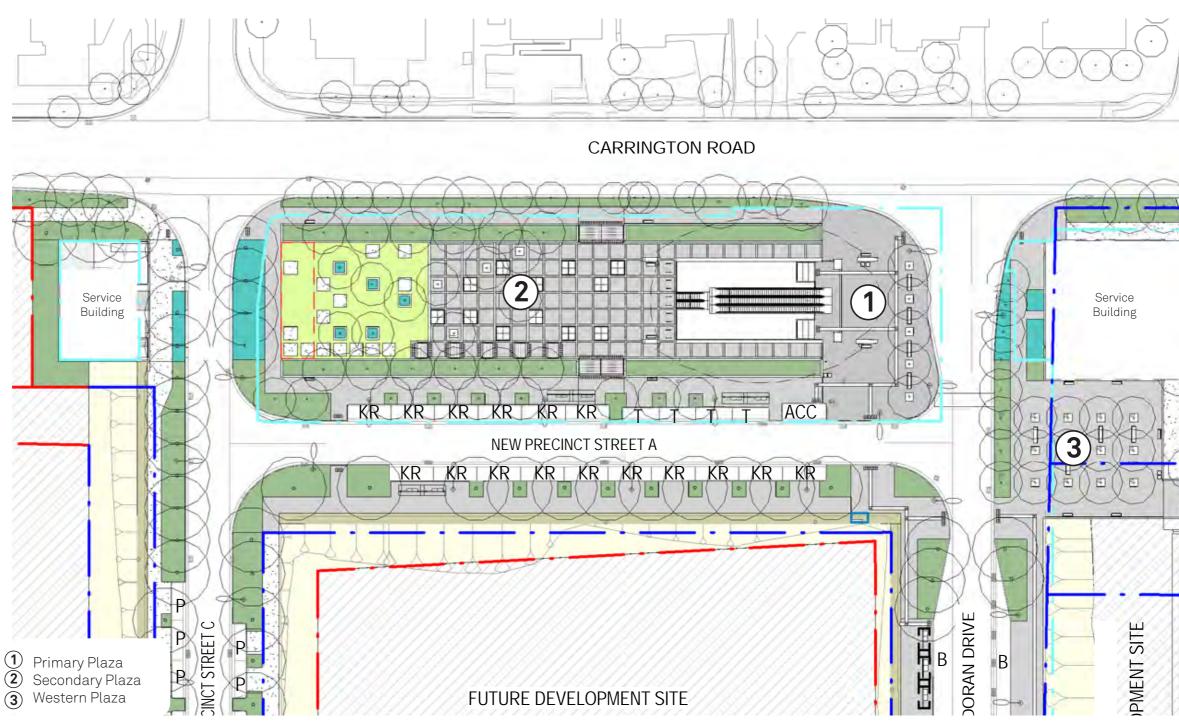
SHW_Showground Station Landscape Plaza Plan. Source: HASSELL
